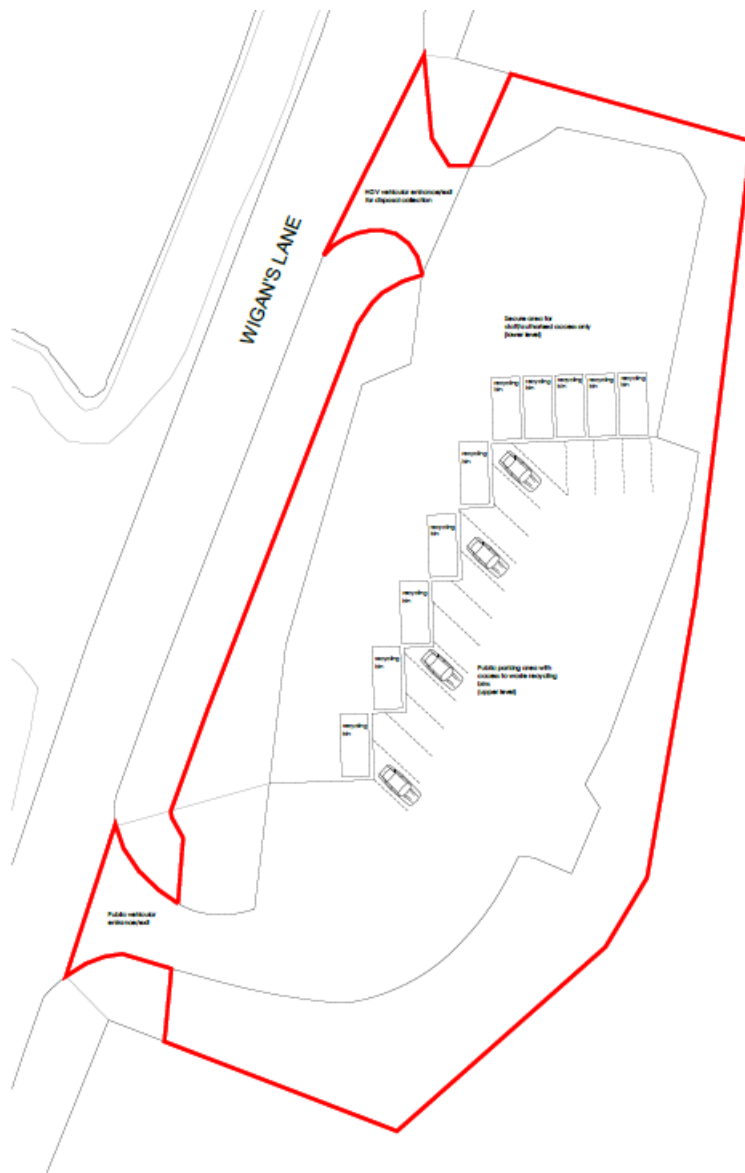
Location of The Bledlow Ridge Household Recycling Centre and the application site.
